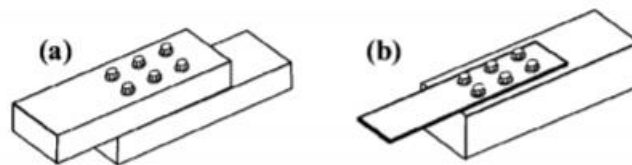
Single-shear timber connections: a) wood-wood connection b) wood-steel connection [6]
